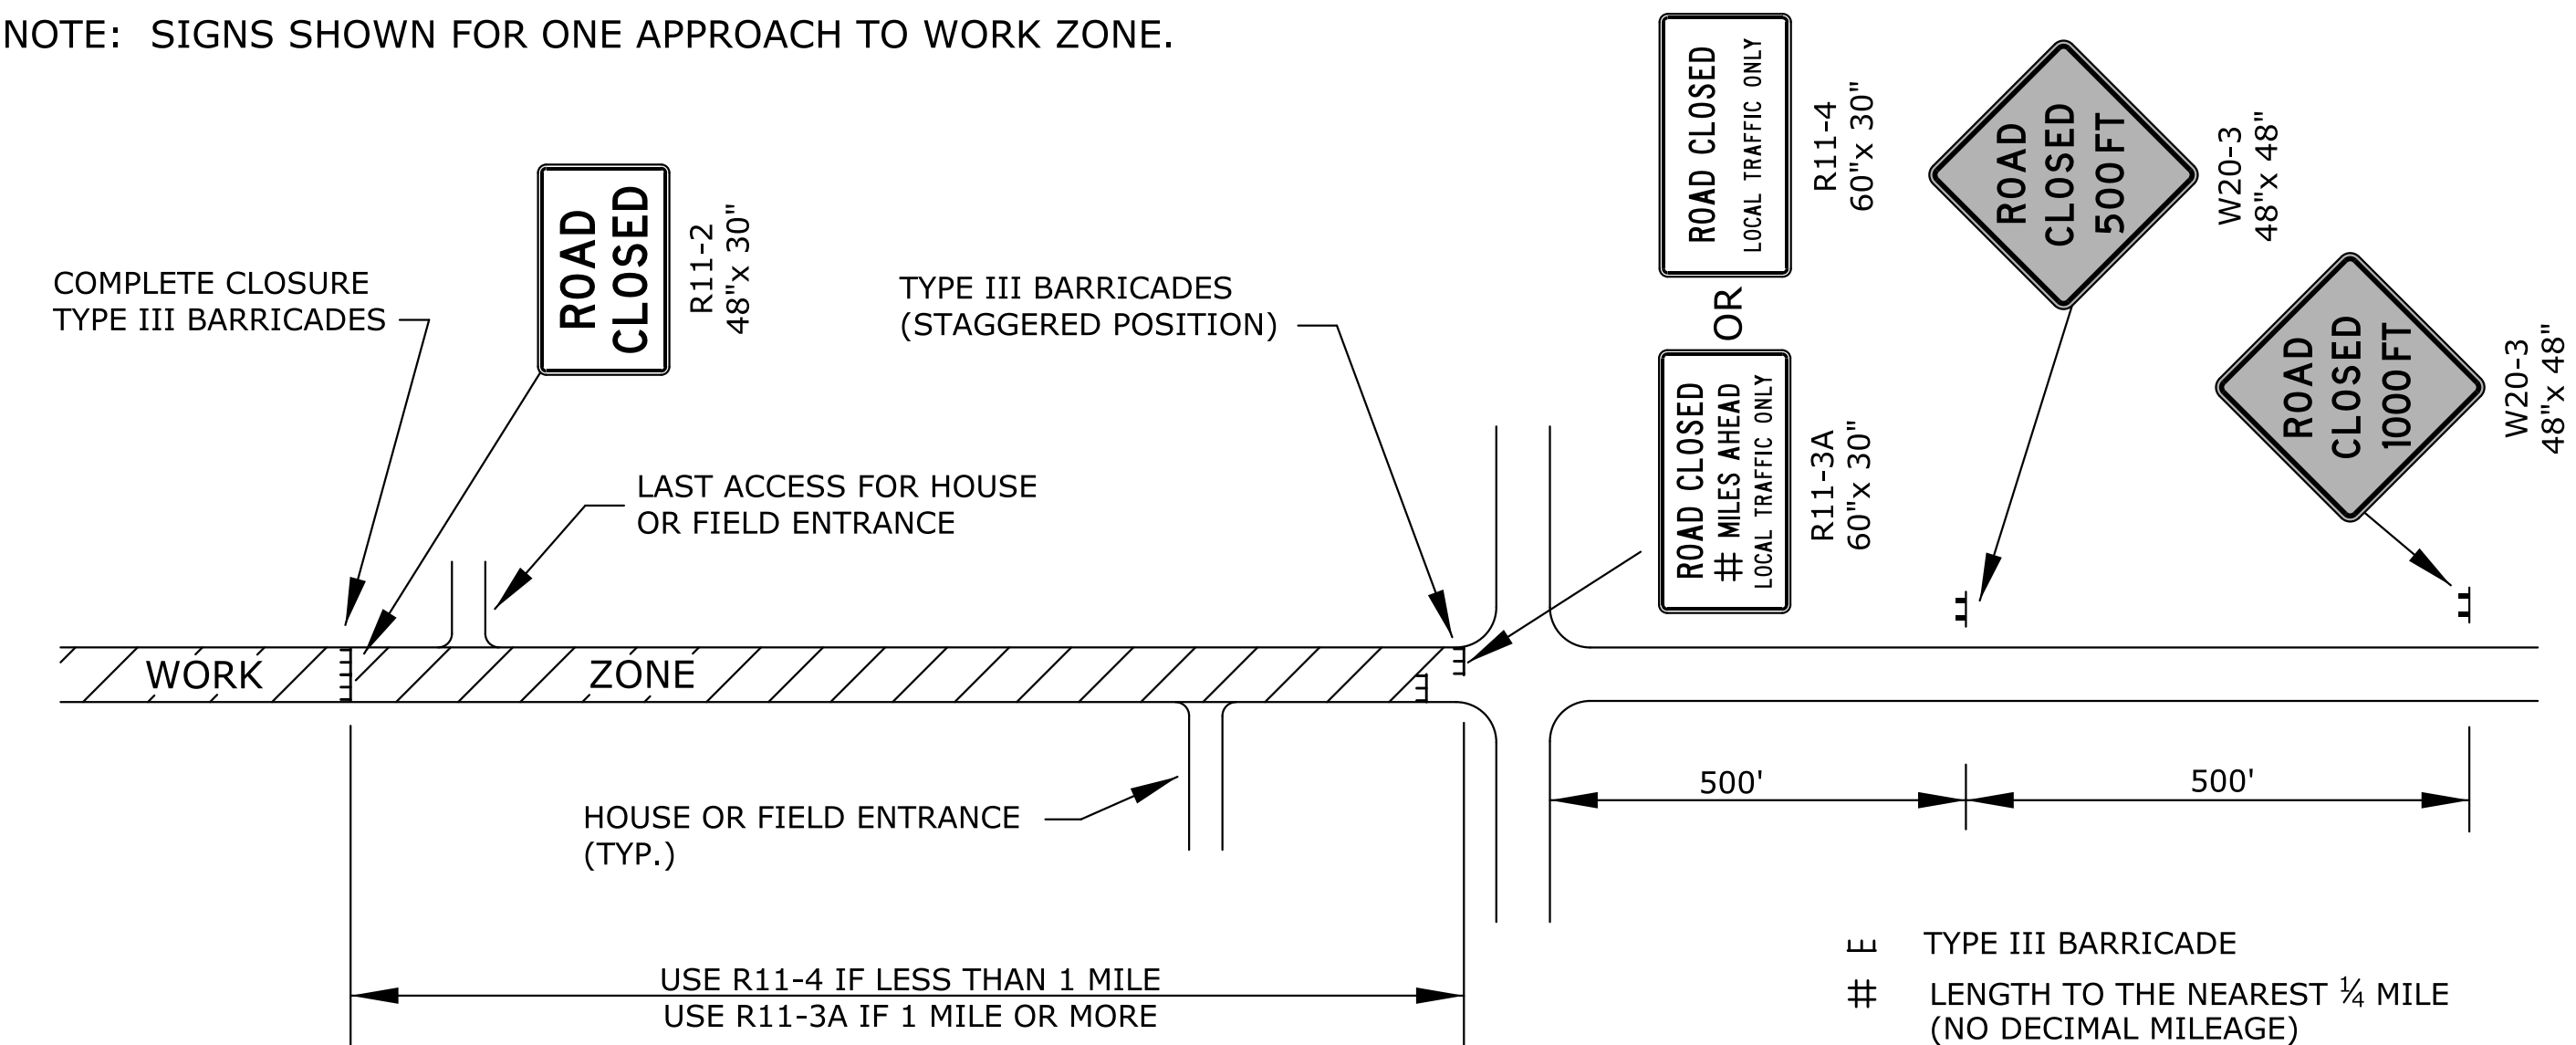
TYPICAL SIGNING FOR ROAD CLOSURE - LOCAL TRAFFIC ACCESS
